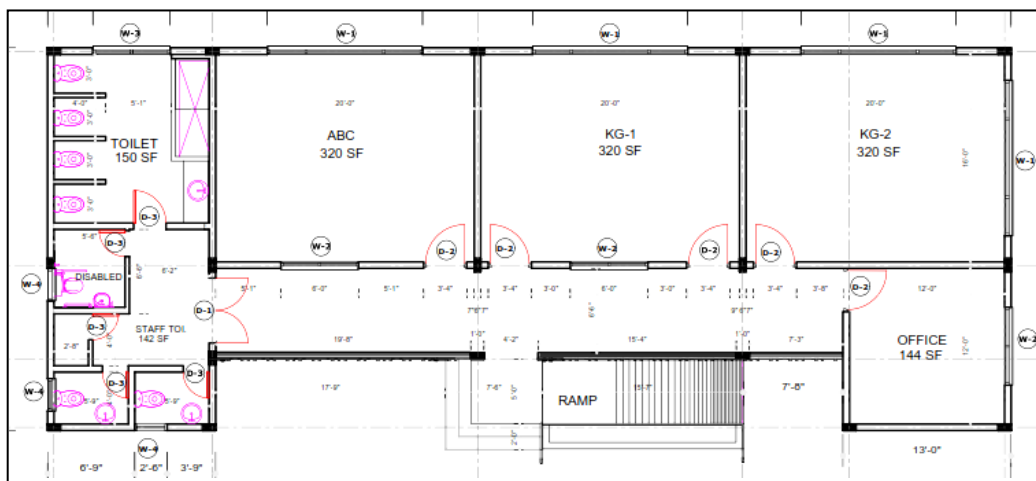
Floor Layout Plan of 3 - Classroom ECE School
